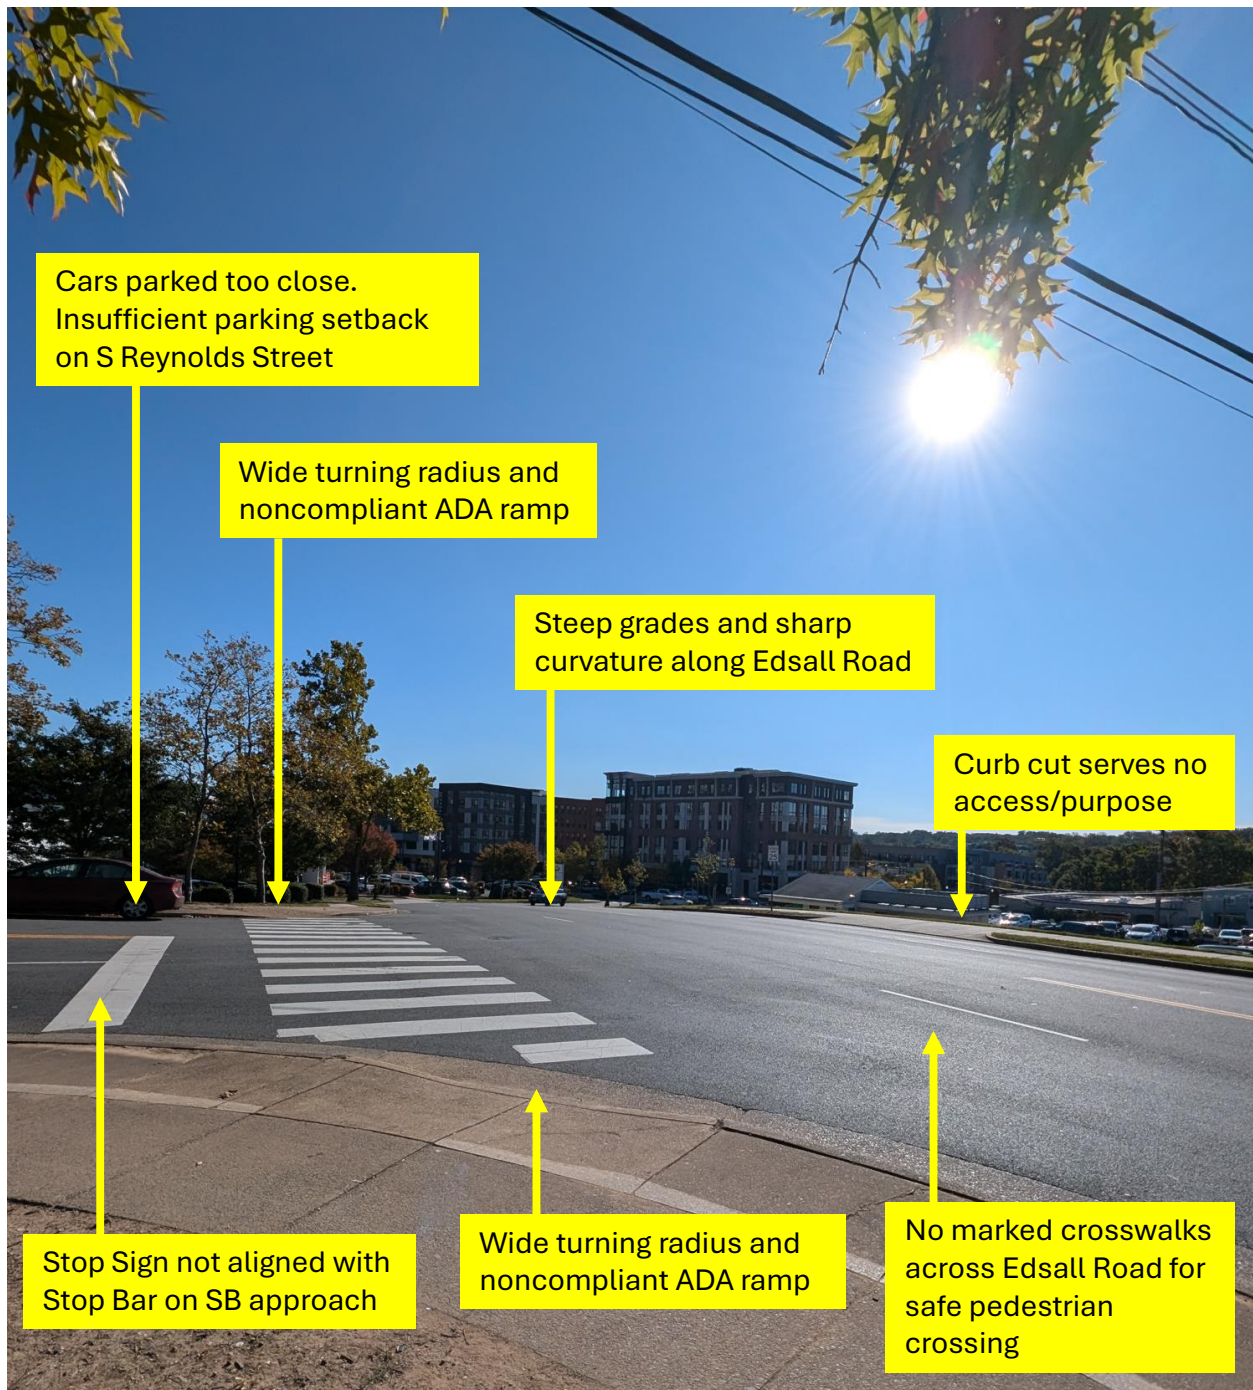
Edsall Road and S Reynolds Street – northwest corner of intersection looking east
